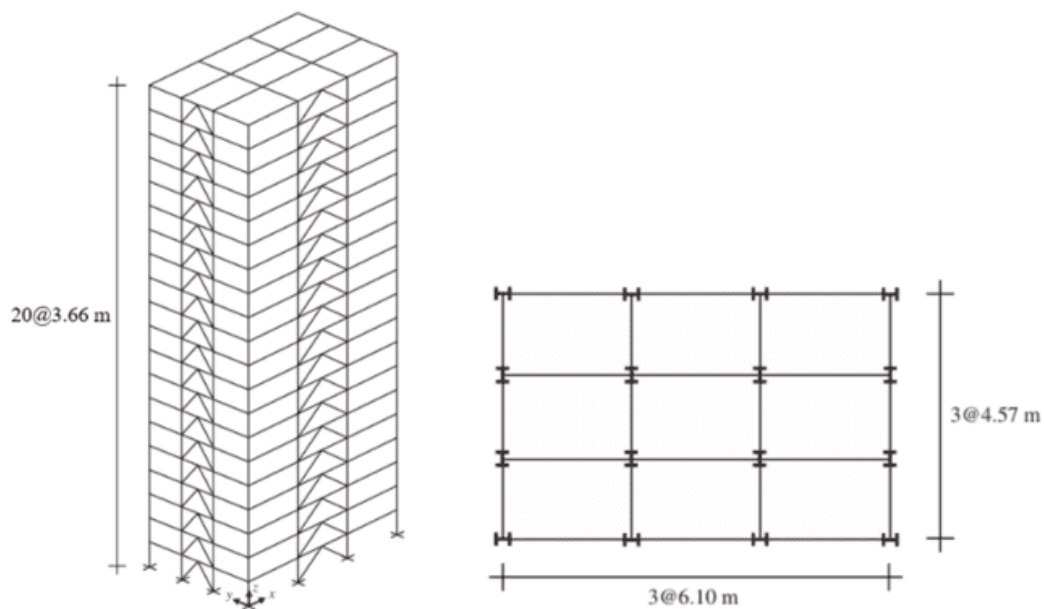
3D and plan view of the 20-story 3D steel frame structure.
